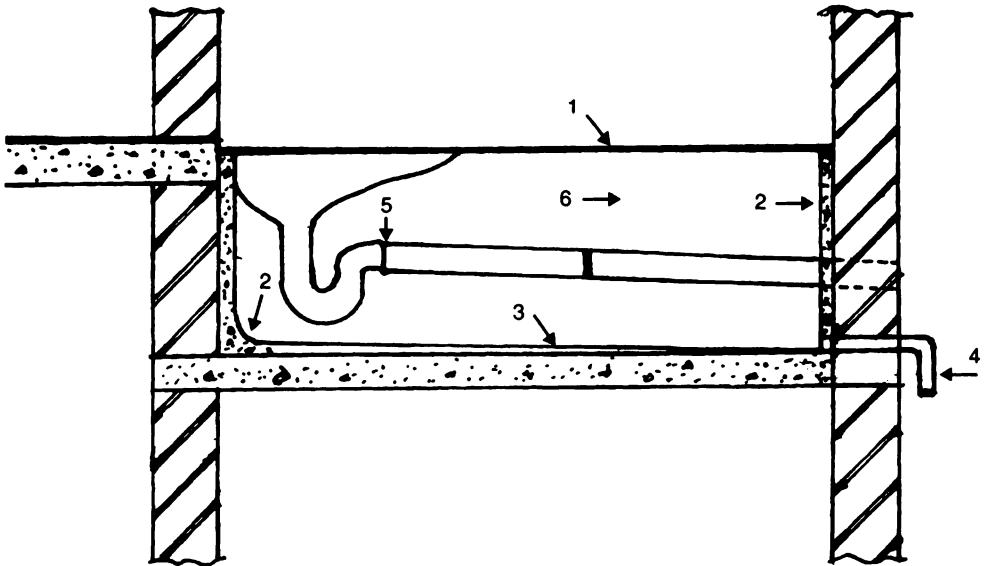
Treatment of sunken areas for water closets (WC) in upper floors: 1. Floor tiles with special joint filler, 2. 50 mm of 1 : 2 : 4 reinforced cement concrete layer coated with bitumen or special waterproofing slurry, 3. Waterproofing plaster coated with bitumen as special waterproofing slurry coat, 4. 25 mm exit pipe, 5. Pipe joints with special plastic sealant to prevent shrinkage and also allow some movement, 6. Brickjelly concrete (without sand) filling.
